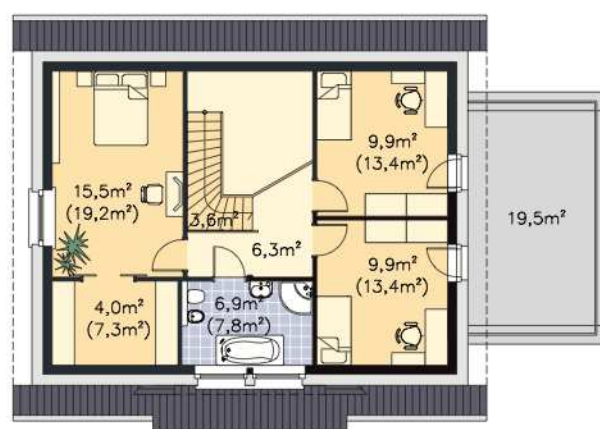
First floor plan of the passive house in Smolec. [15]
